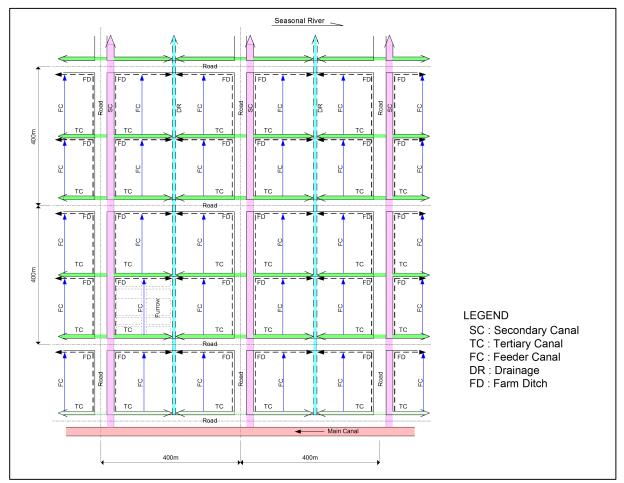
Layout of Irrigation and drainage Facilities in Command Area
